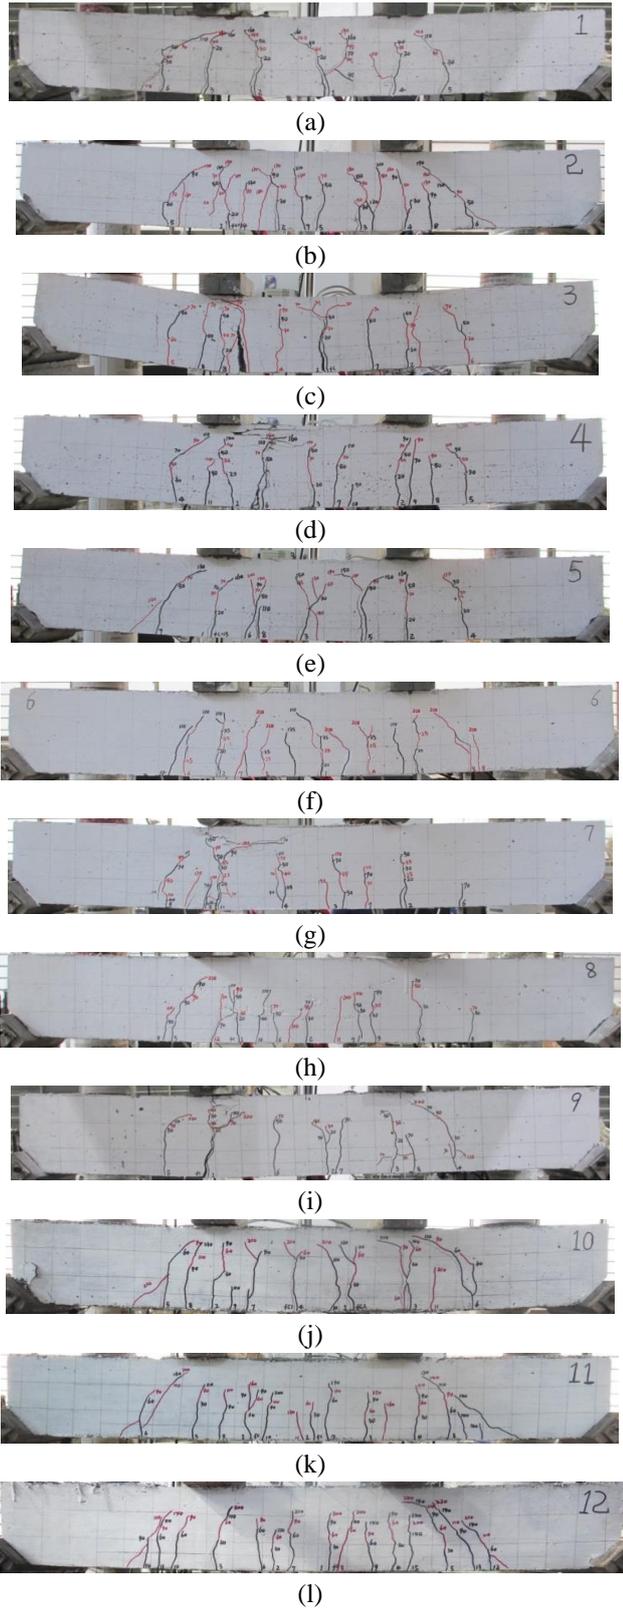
Crack patterns of the tested symmetric inclination beams after unloading
